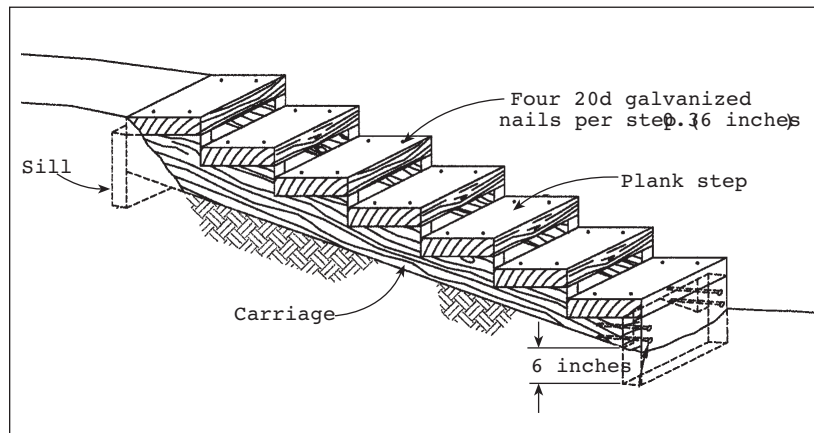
Plank stairway. (Jackson, B. 1993. Recreation Site Design)
